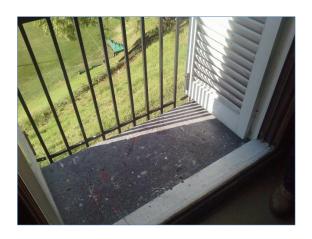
Studio 3 - 2.5 - Compressed asbestos cement bench in south east corner of room
